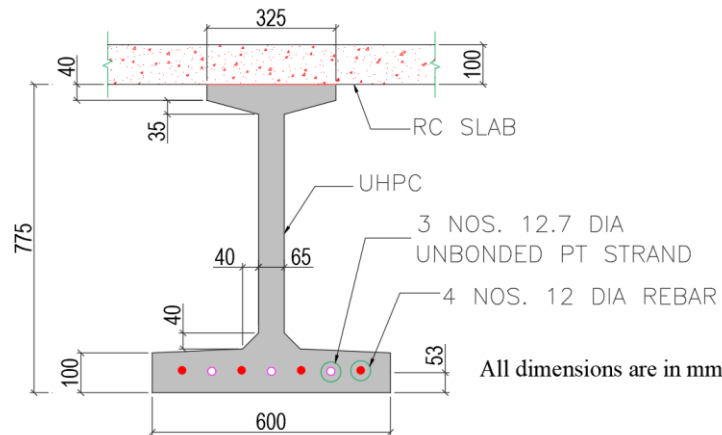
Cross-section geometry of the proposed unbonded post-tensioned UHPC beam section compositely connected with RC deck slab (1 in. = 25.4mm)
